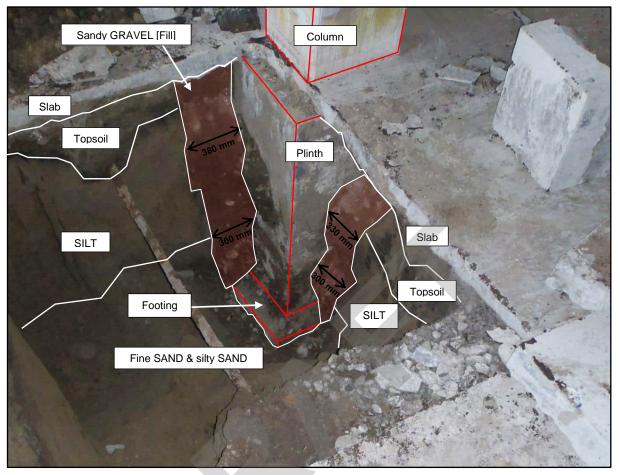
Column C7 ground profile facing north-west. All measurements are approximate.
